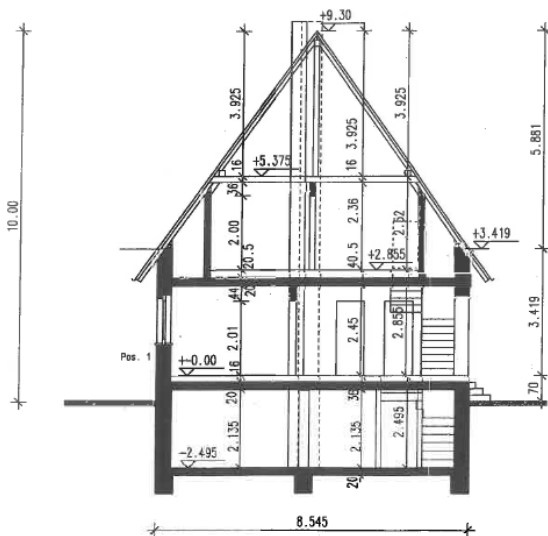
Sectional view from a southern perspective, taken from the construction plans of the case study building.
